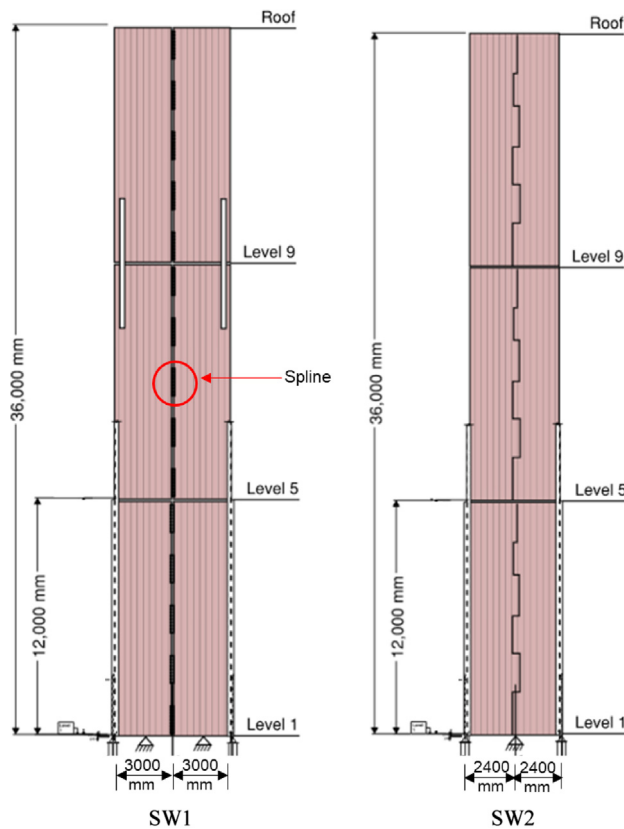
Overview – shear walls SW1 and SW2 (RJC engineers, 2021) [22].
